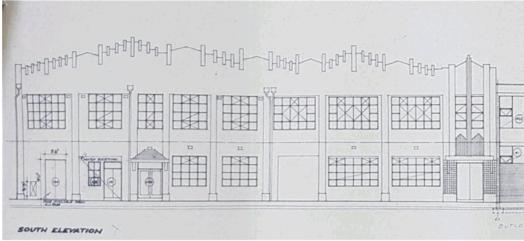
1965 drawings - detail of the two-storey Art Deco facade and its detail in 1965 (PROV, 12 March 1965).
